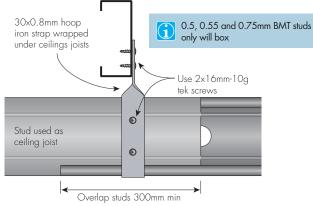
Ceiling Continuous Joist to Hoop Iron Strap
